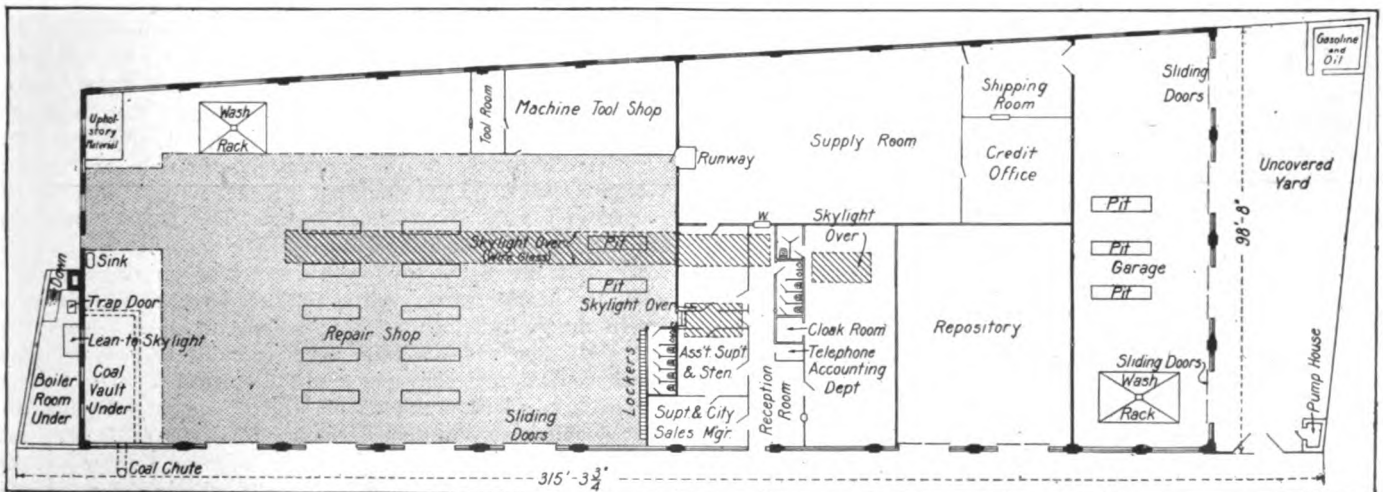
Floor plan of new Alco service building in Long Island City, showing the division of the brick building into three departments, serving as shop, office and supply room, and garage, respectively. The shop is shown by dotting, while the cross-hatching denotes skylights supplying ample access of daylight throughout the building
